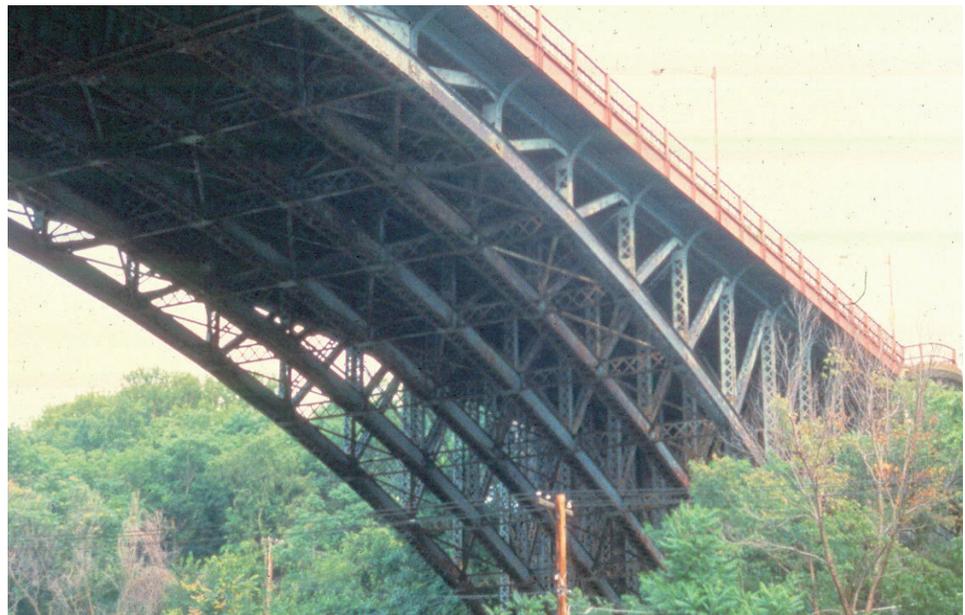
Spandrel Braced Deck Arch with Six Arch Ribs
